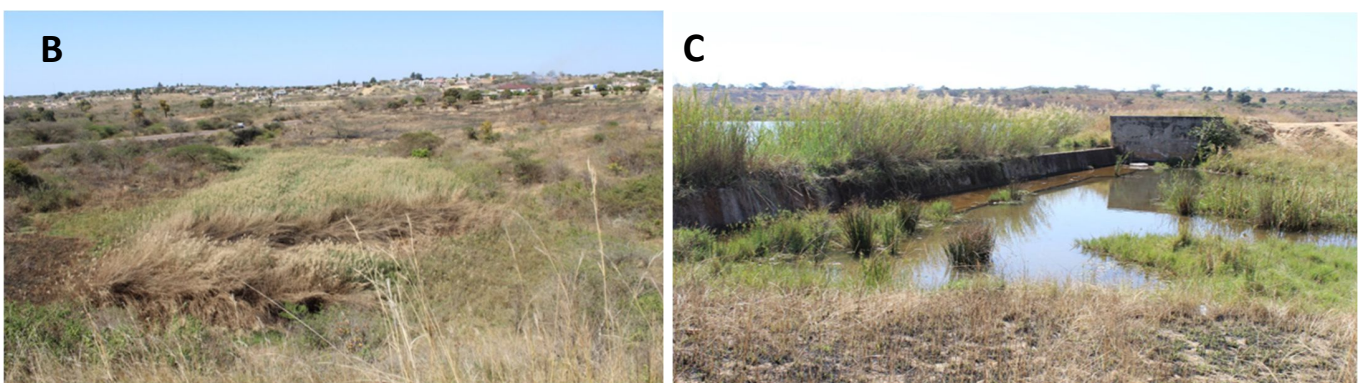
(B) Seepage below dam embankment (C) Spillway apron
